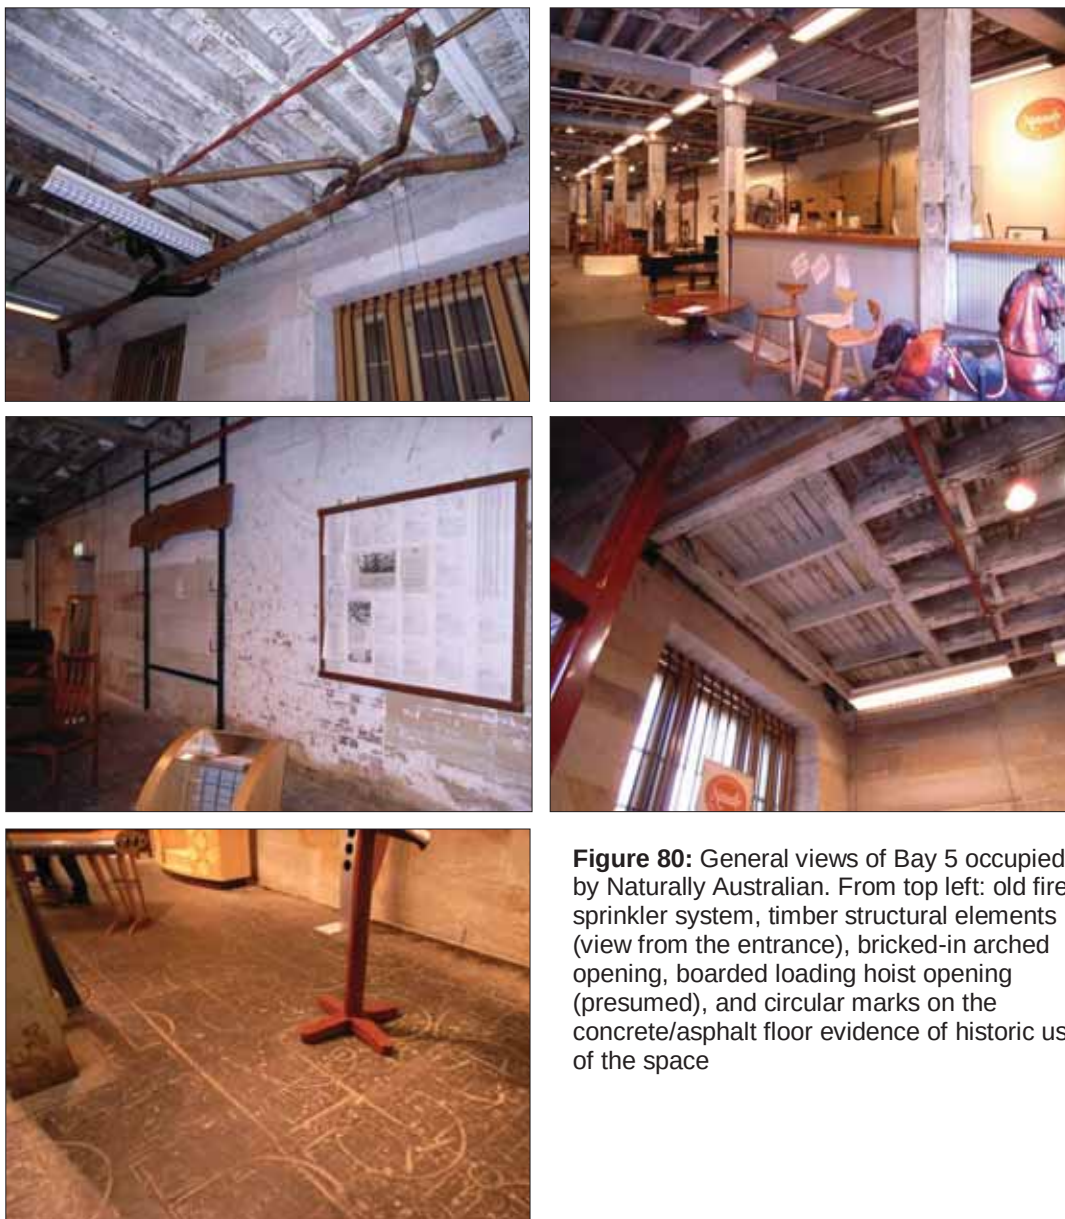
General views of Bay 5 occupied by Naturally Australian. From top left: old fire sprinkler system, timber structural elements (view from the entrance), bricked-in arched opening, boarded loading hoist opening (presumed), and circular marks on the concrete/asphalt floor evidence of historic use of the space
